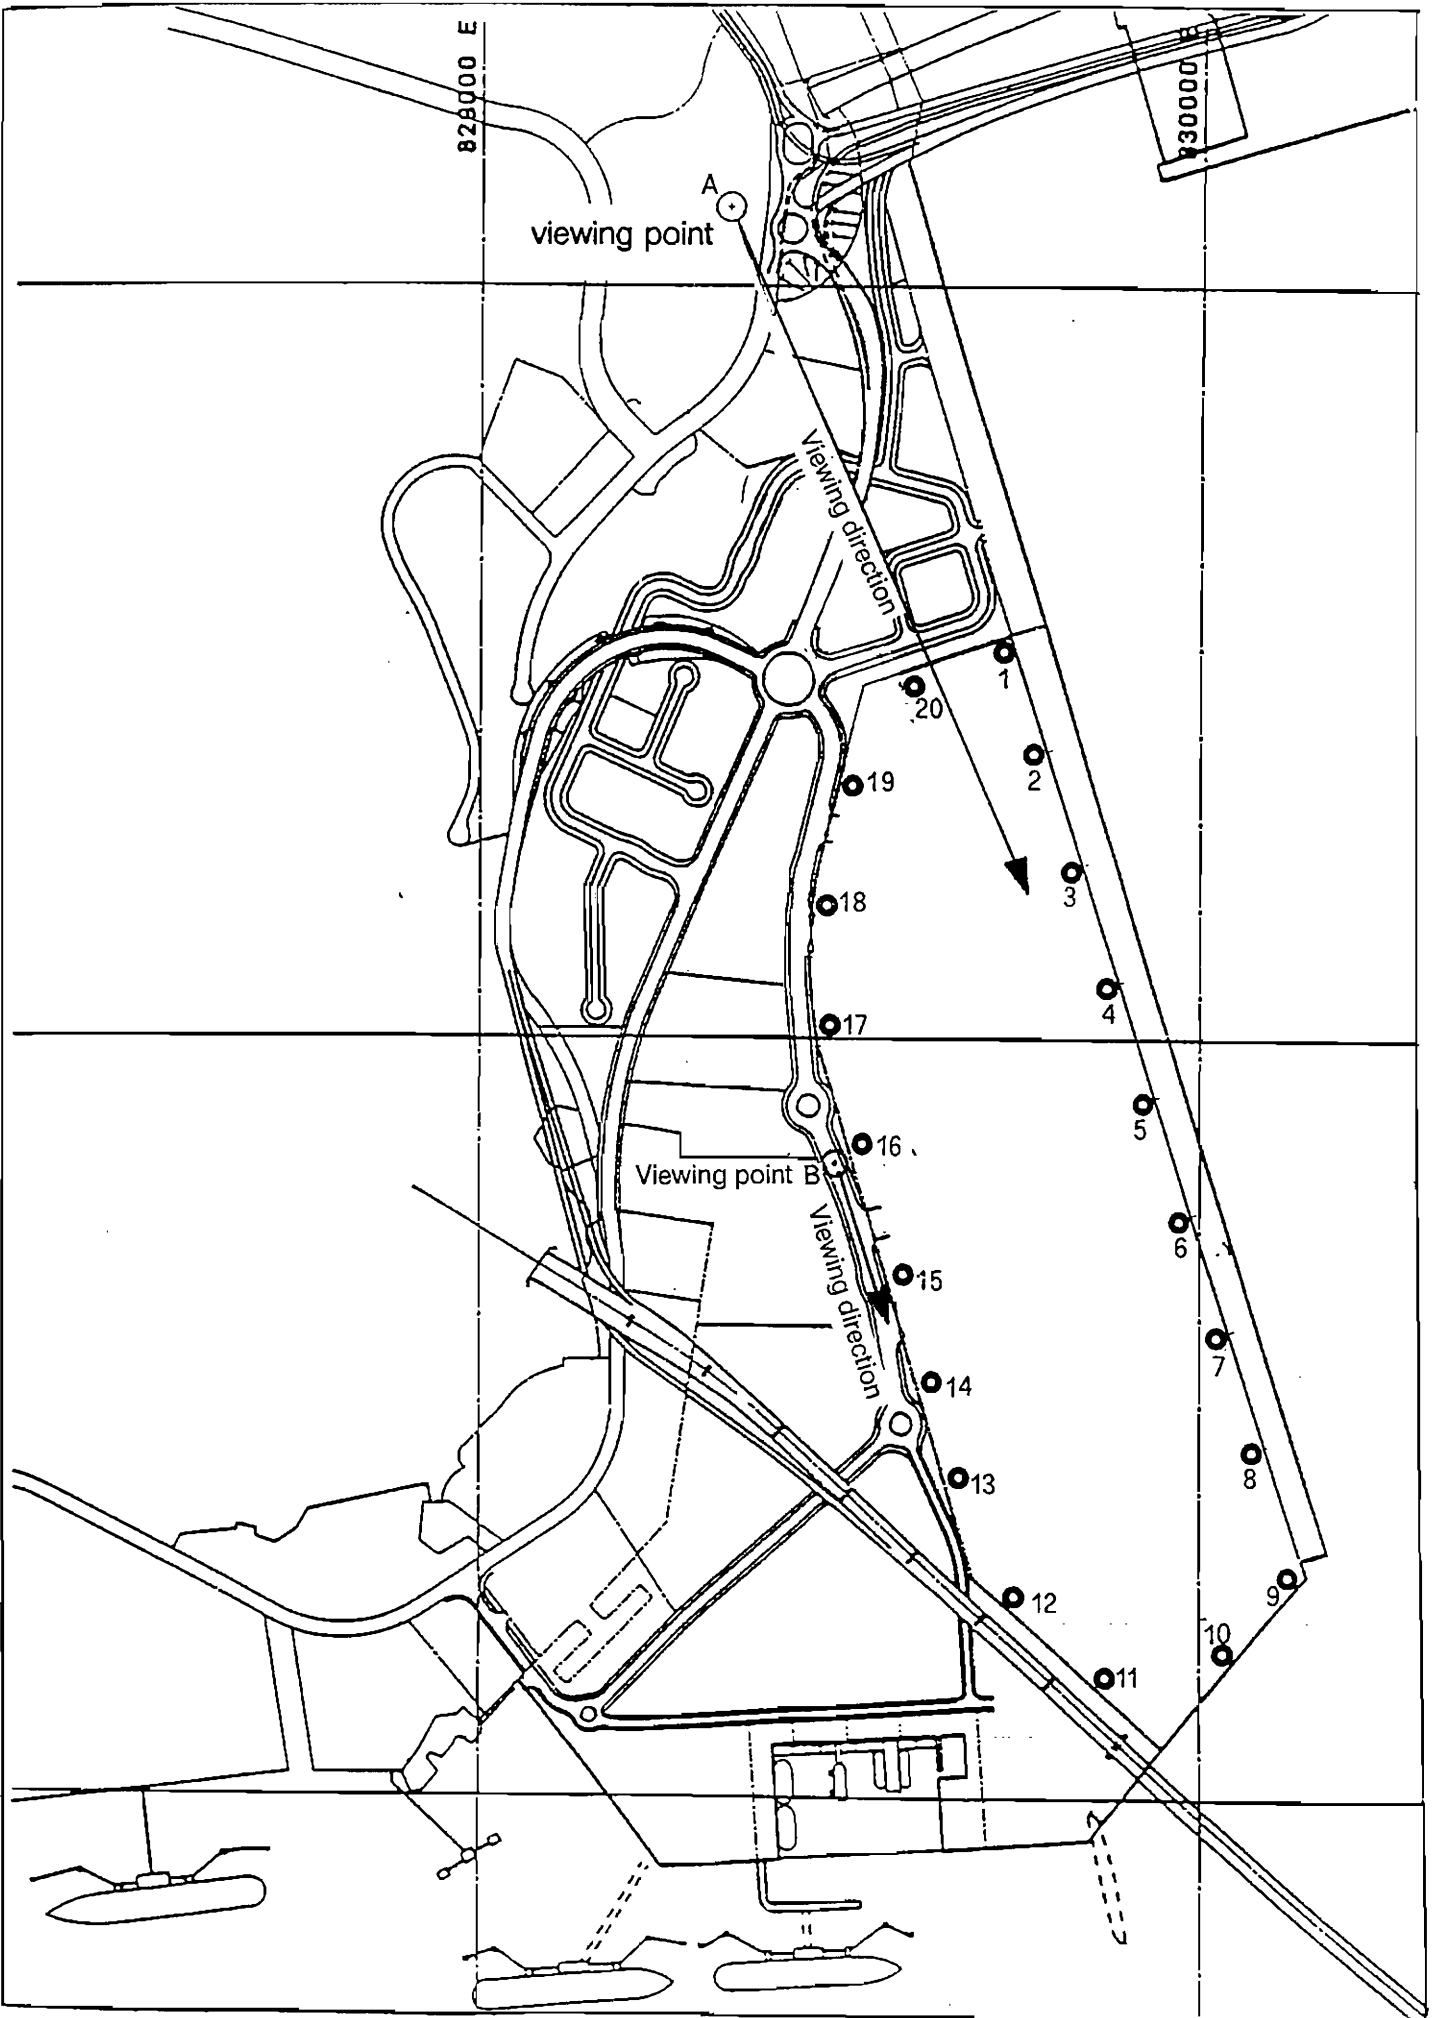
PROPOSED LOCATION OF LIGHTING TOWERS
